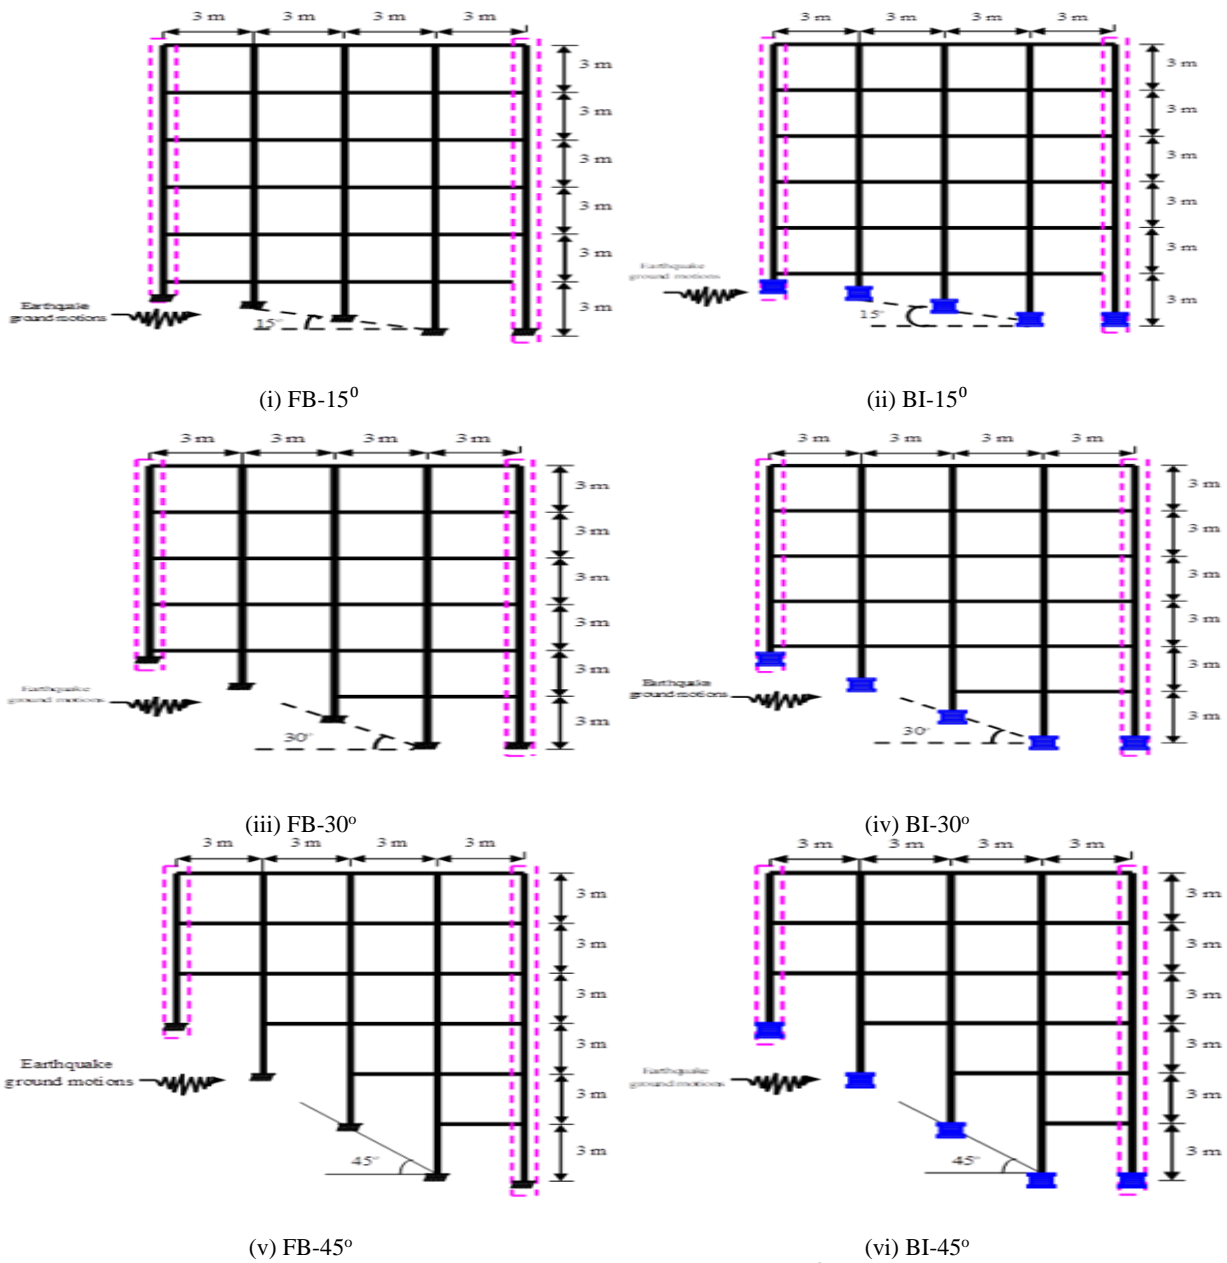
Elevation of Fixed base and Base-Isolated buildings resting on 15°,30° and 45° hill slopes.
